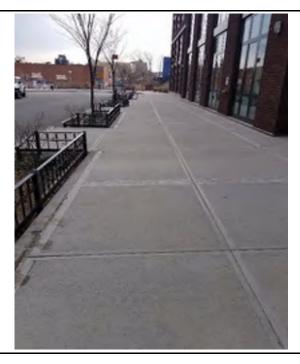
1st Street sidewalk, facing southeast. 27 February 2019.
